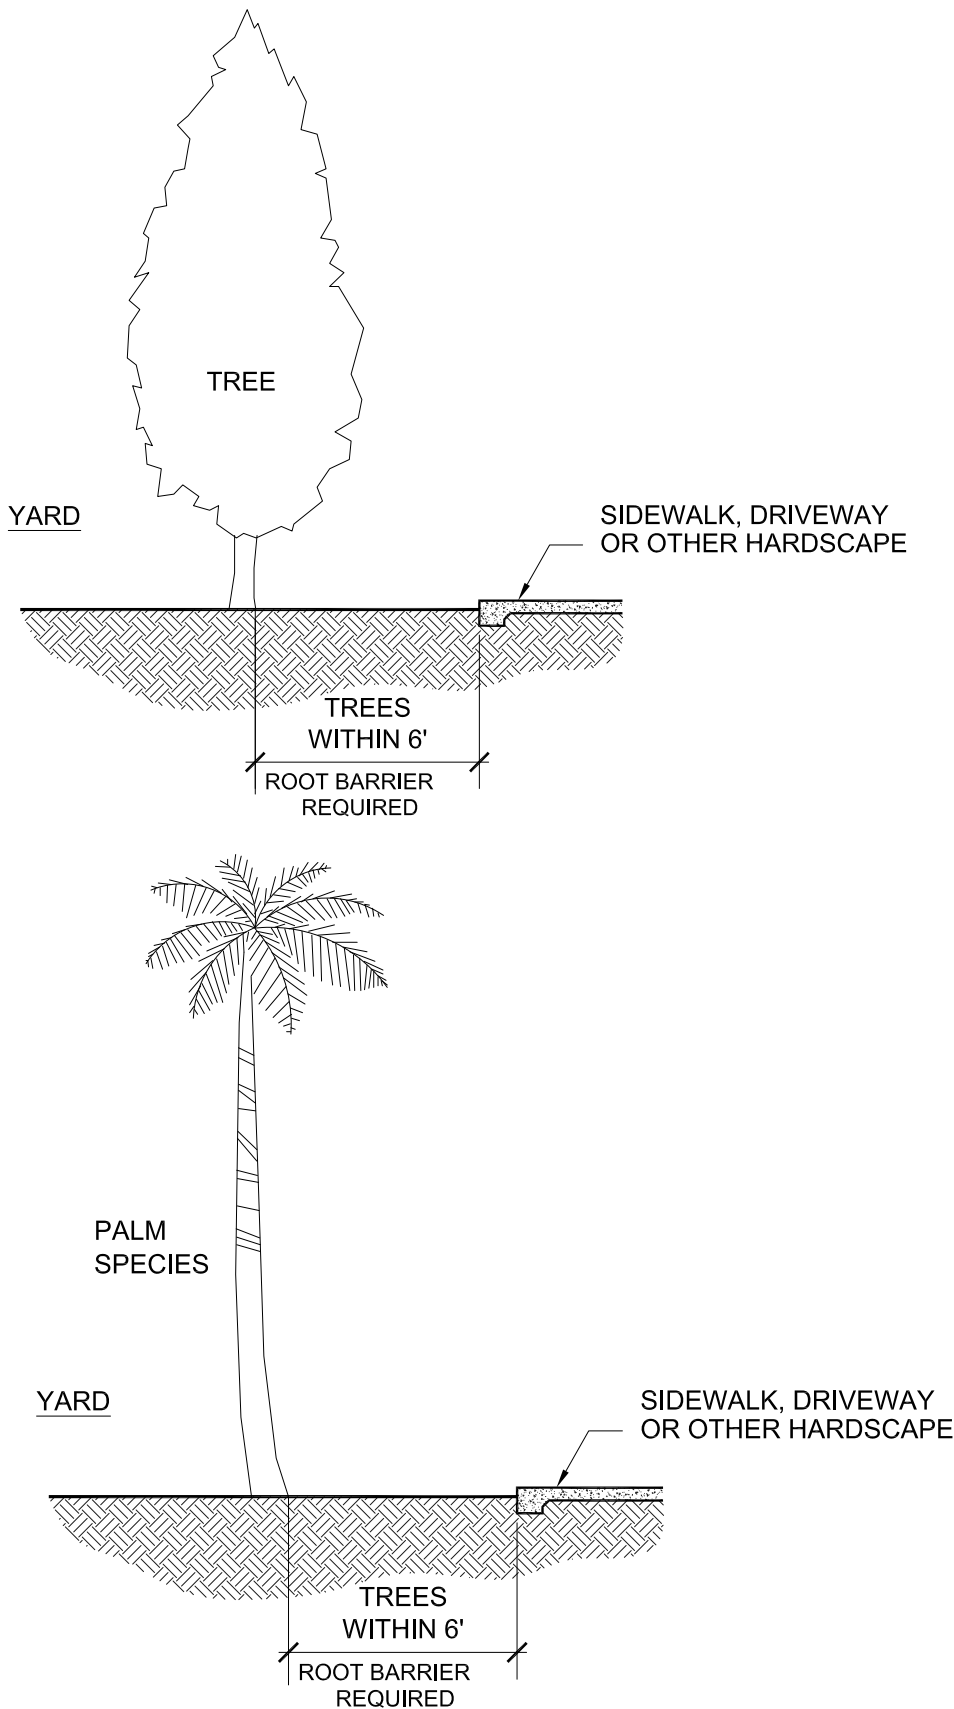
F: MINIMUM PLANTING DISTANCES
